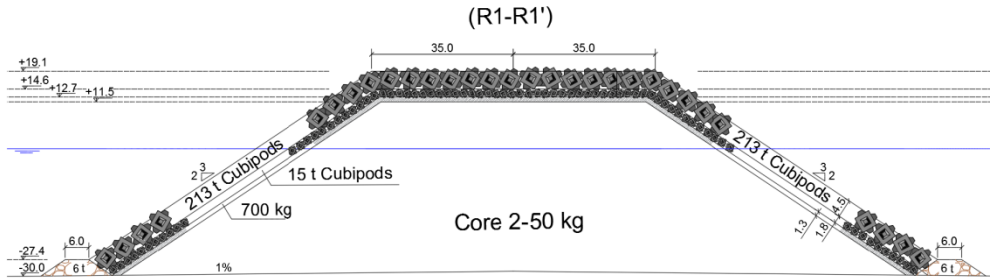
Cross section of single-layer Cubipod[®] armored roundhead (Alternative B1).
